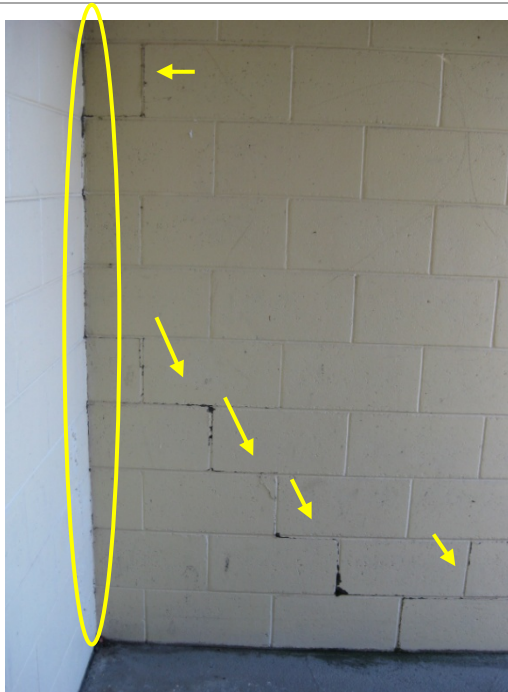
Hairline Cracking along the Mortar Joints on the North Wall of the Gents
